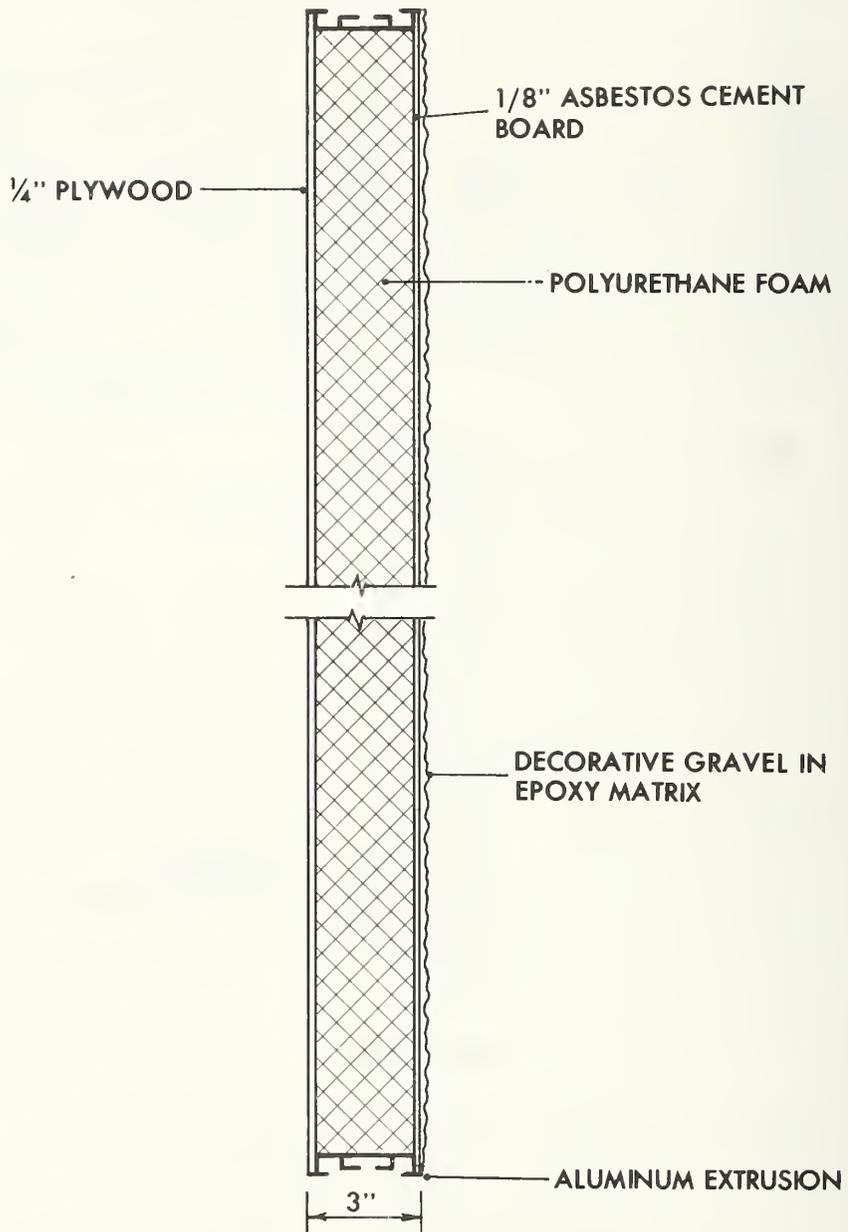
Foamed plastic core sandwich test panel (ACUP).
